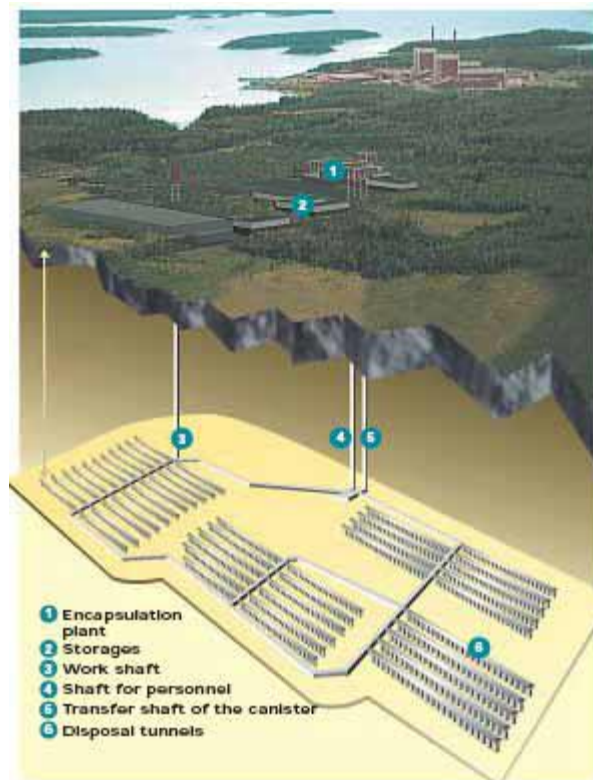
A possible design of the final disposal facility planned to be constructed at the Olkiluoto site.
